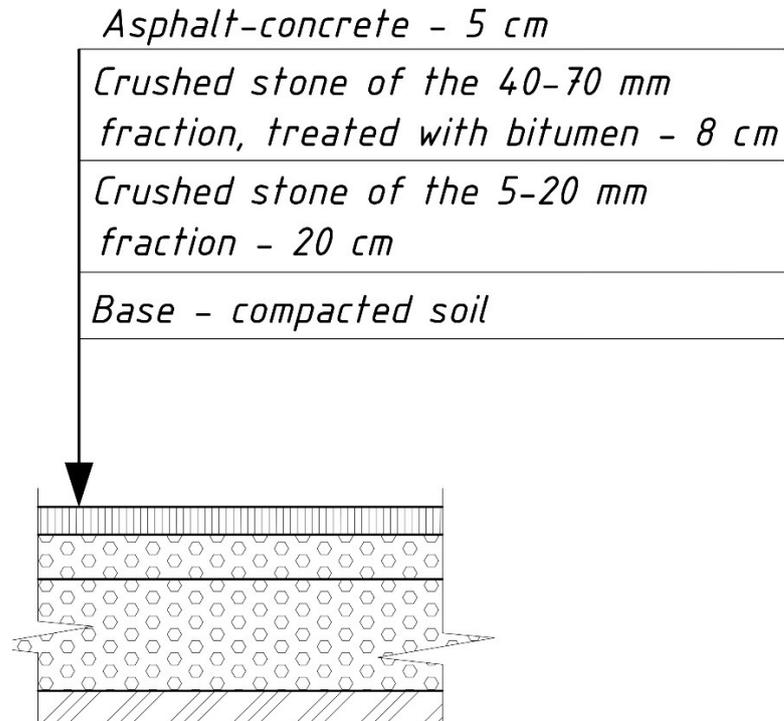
Design of road surface of driveways, unloading area and parking lot
